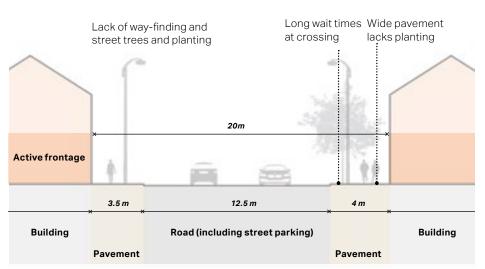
Street section of Bury New Road looking northwest from the Longfield Centre.
